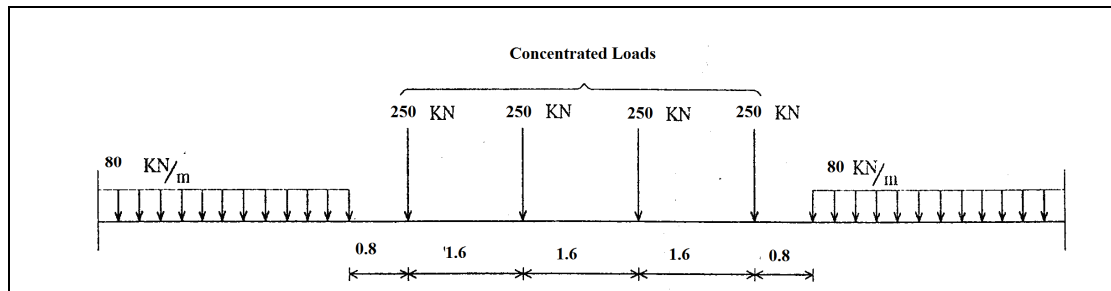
Applied live load based on Iranian Instruction of Bridge Loading (2007)
